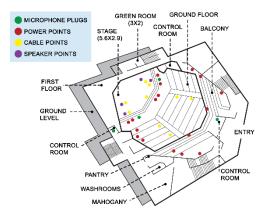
Auditorium layout [Image Source: Author]
